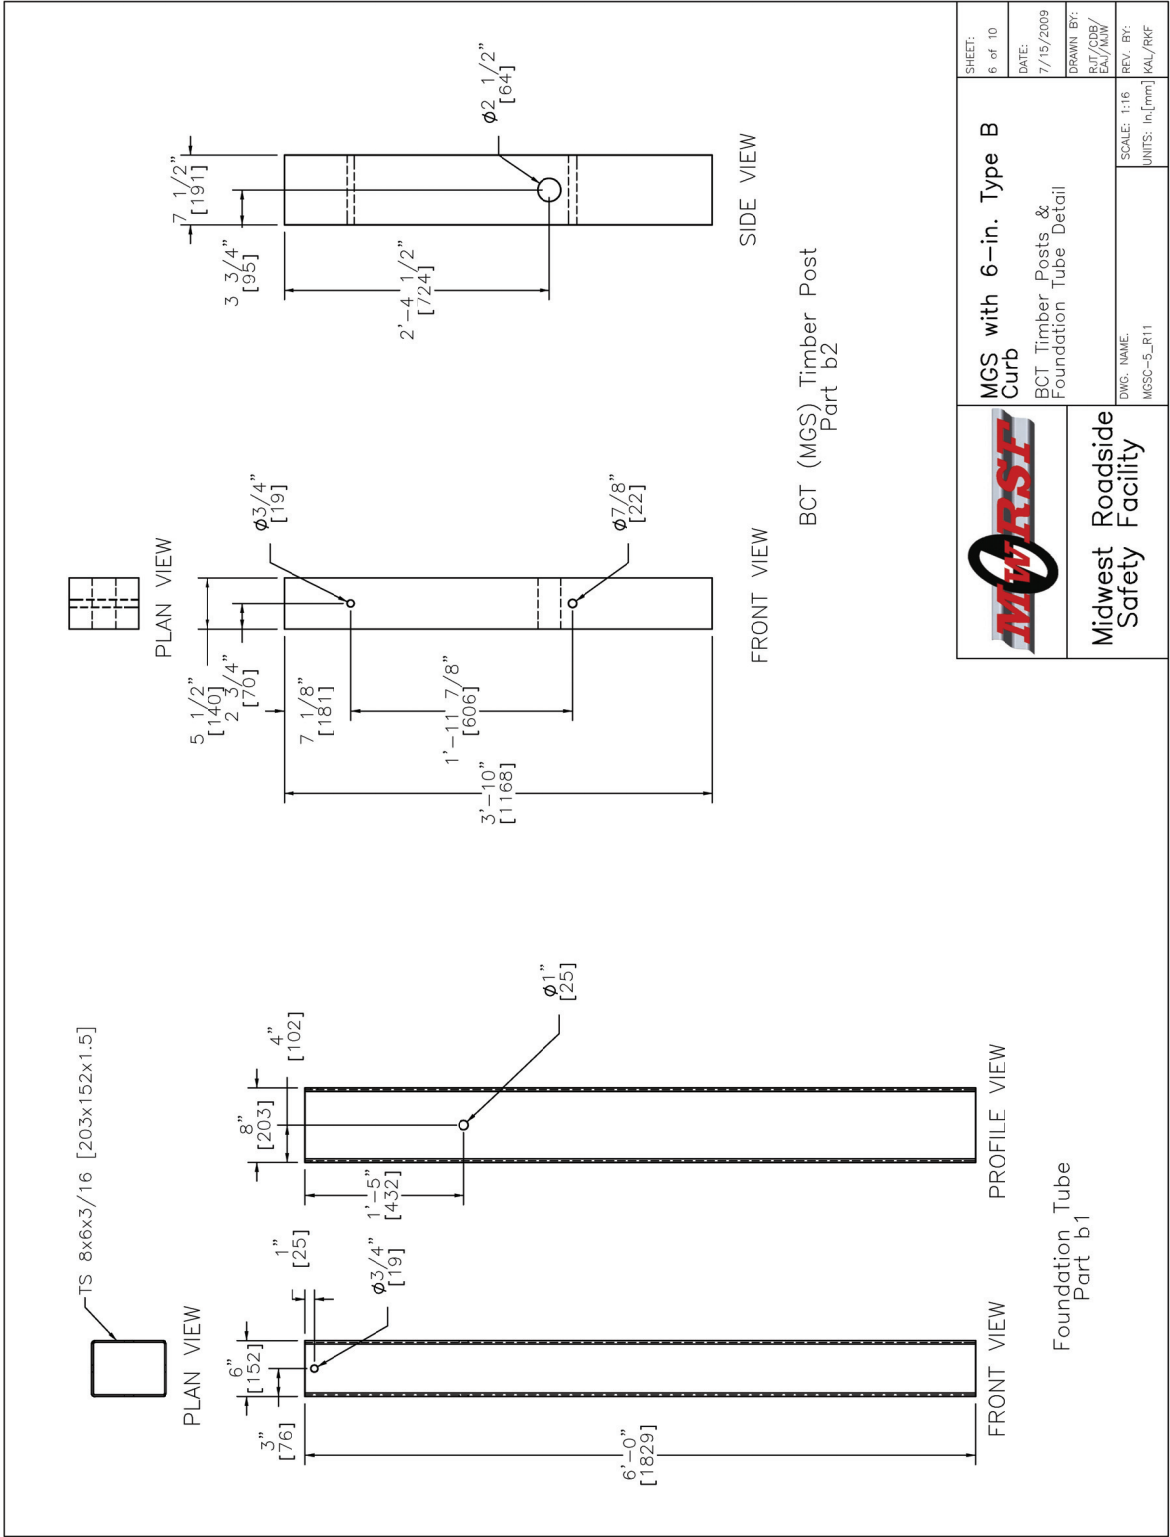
BCT Timber Post and Foundation Tube Details, Test No. MGSC-5
